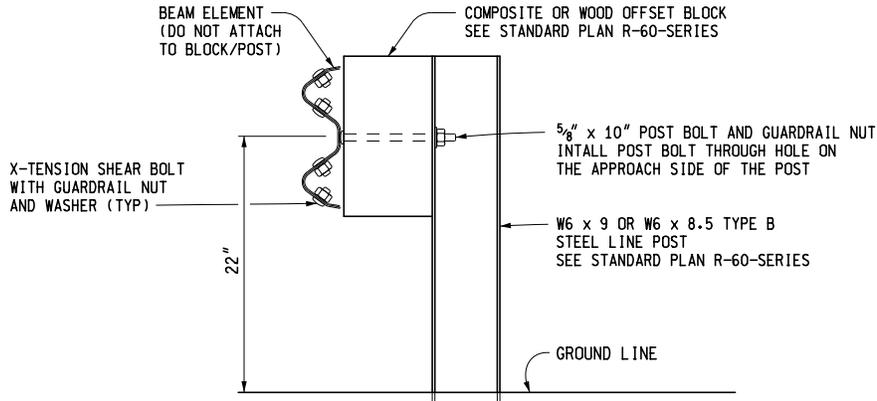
DETAILS ON THIS SHEET ONLY APPLY TO "X-LITE-FLARED".
